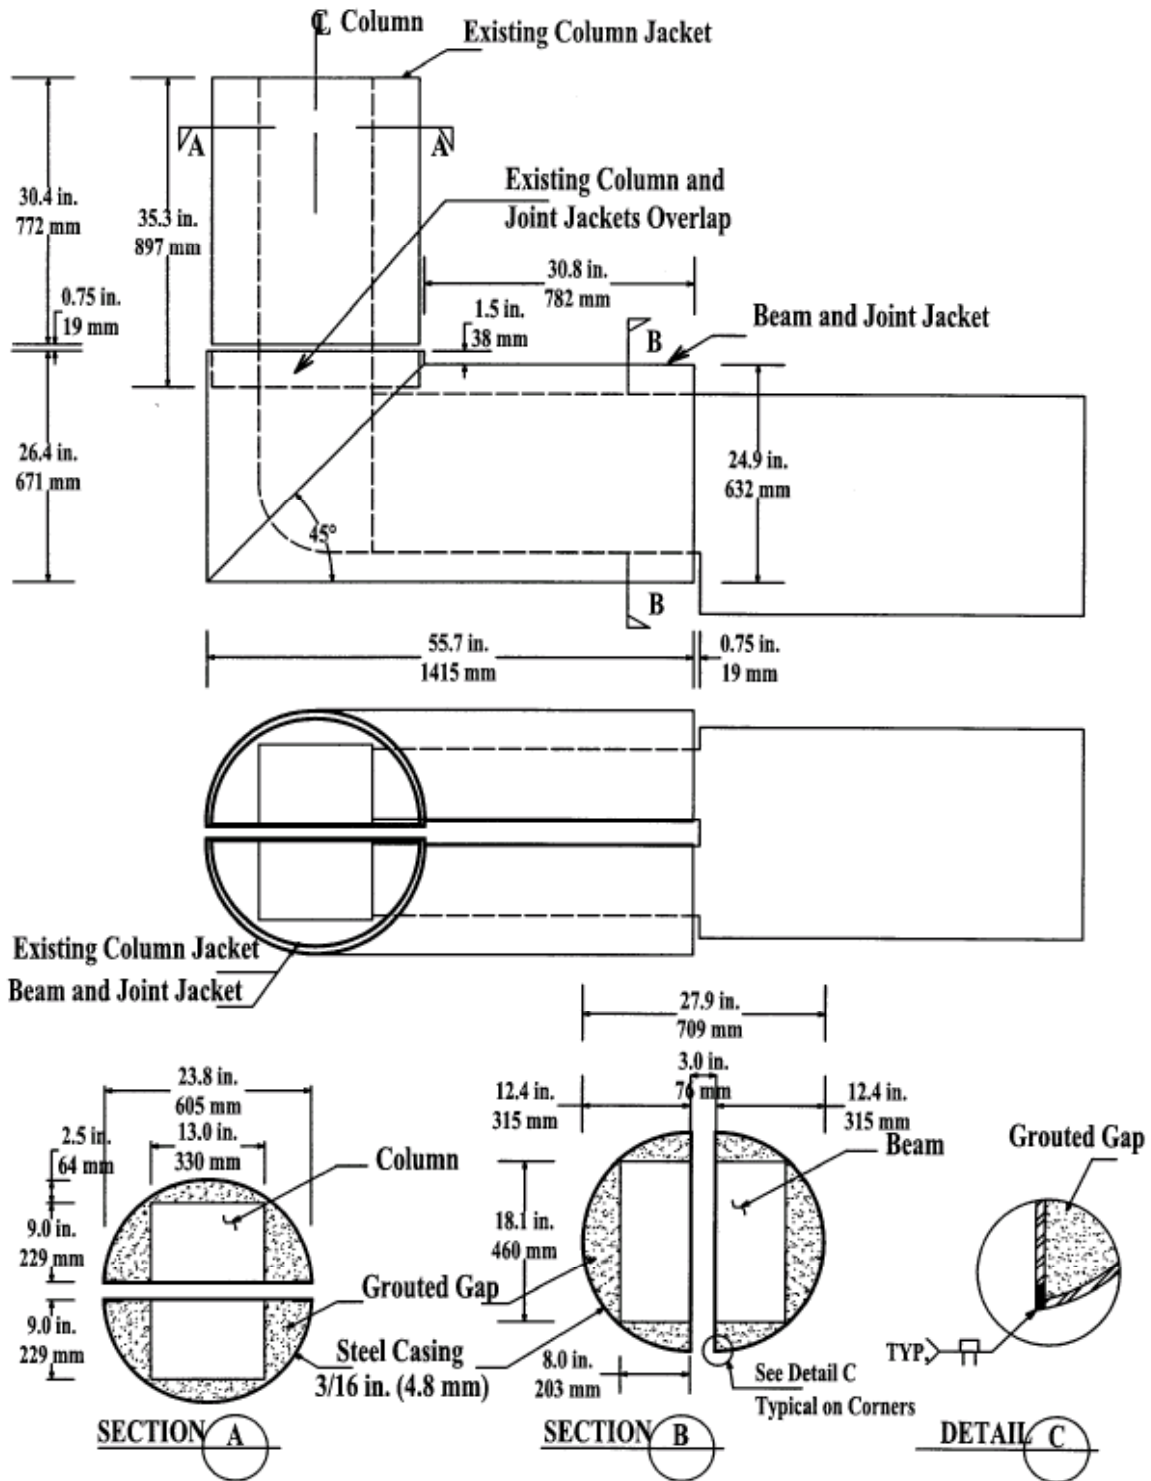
Retrofitted Long Outrigger Clamshell Dimensions (Front View)
